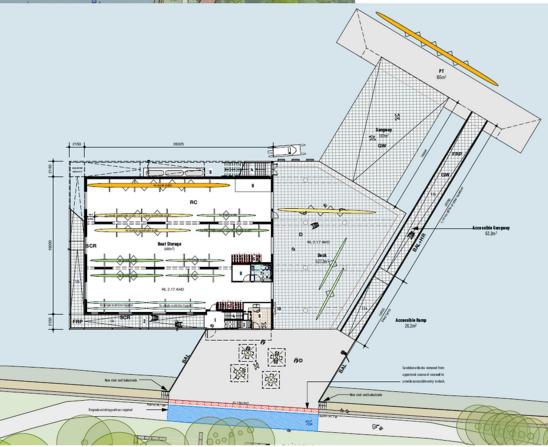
Site, pontoon and ground floor boat shed plan, Hill Thalis
